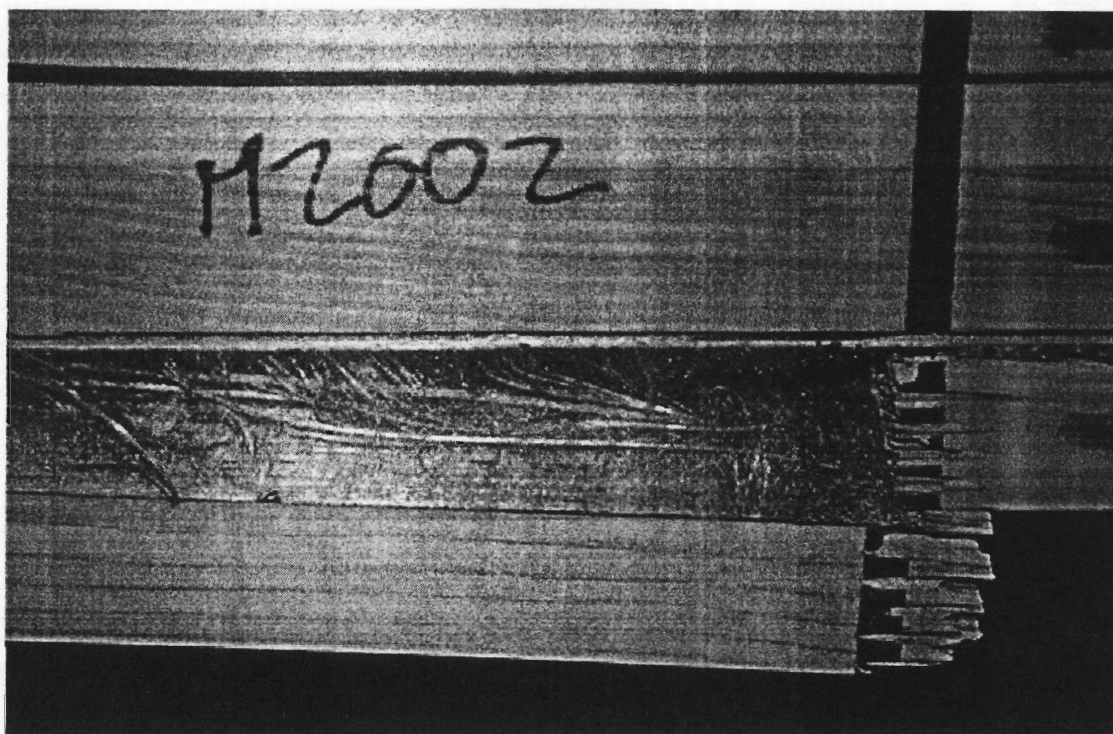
Photograph of finger joint failure in tension lamination adjacent to reinforcement leading to global failure of reinforced beam.
